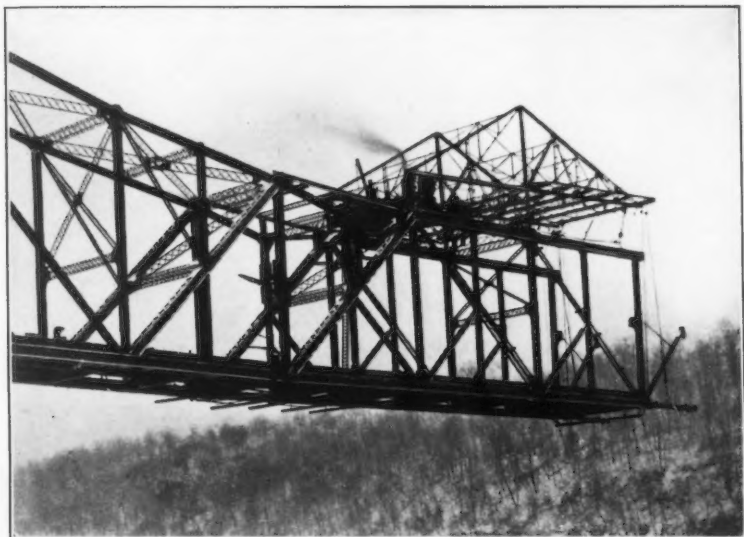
CREEPER TRAVELER AT U_{20} , NORTH SIDE.
